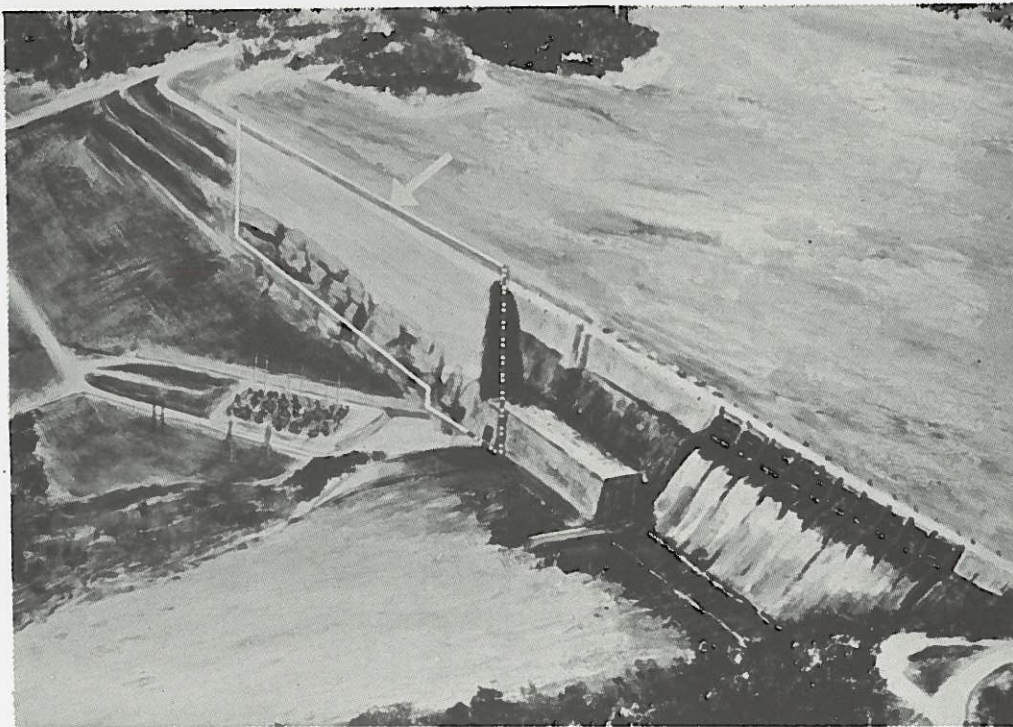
ARTIST'S CONCEPTION OF DIAPHRAGM WALL.
